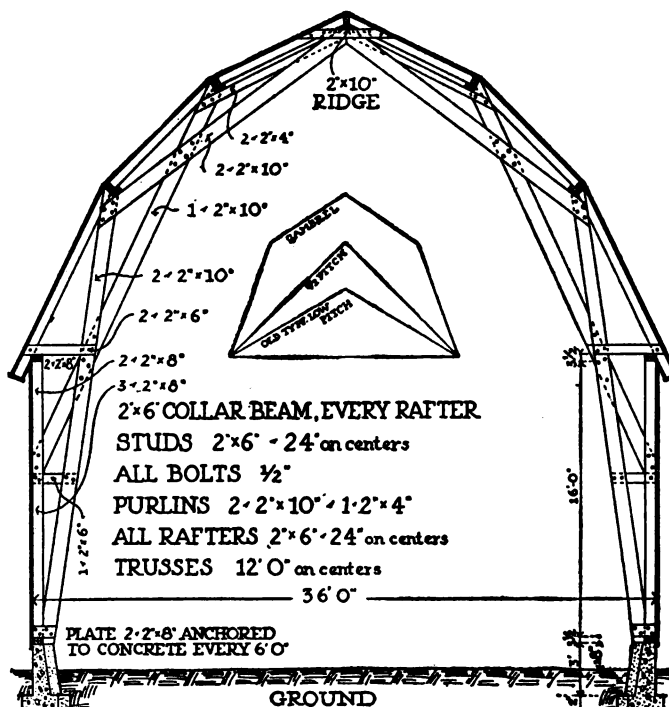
Section of a well-braced hay barn of the double-gambrel roof type, built on a secure concrete foundation. The inset shows the space gained for storage by using a gambrel roof rather than the single high- or low-pitch type.
